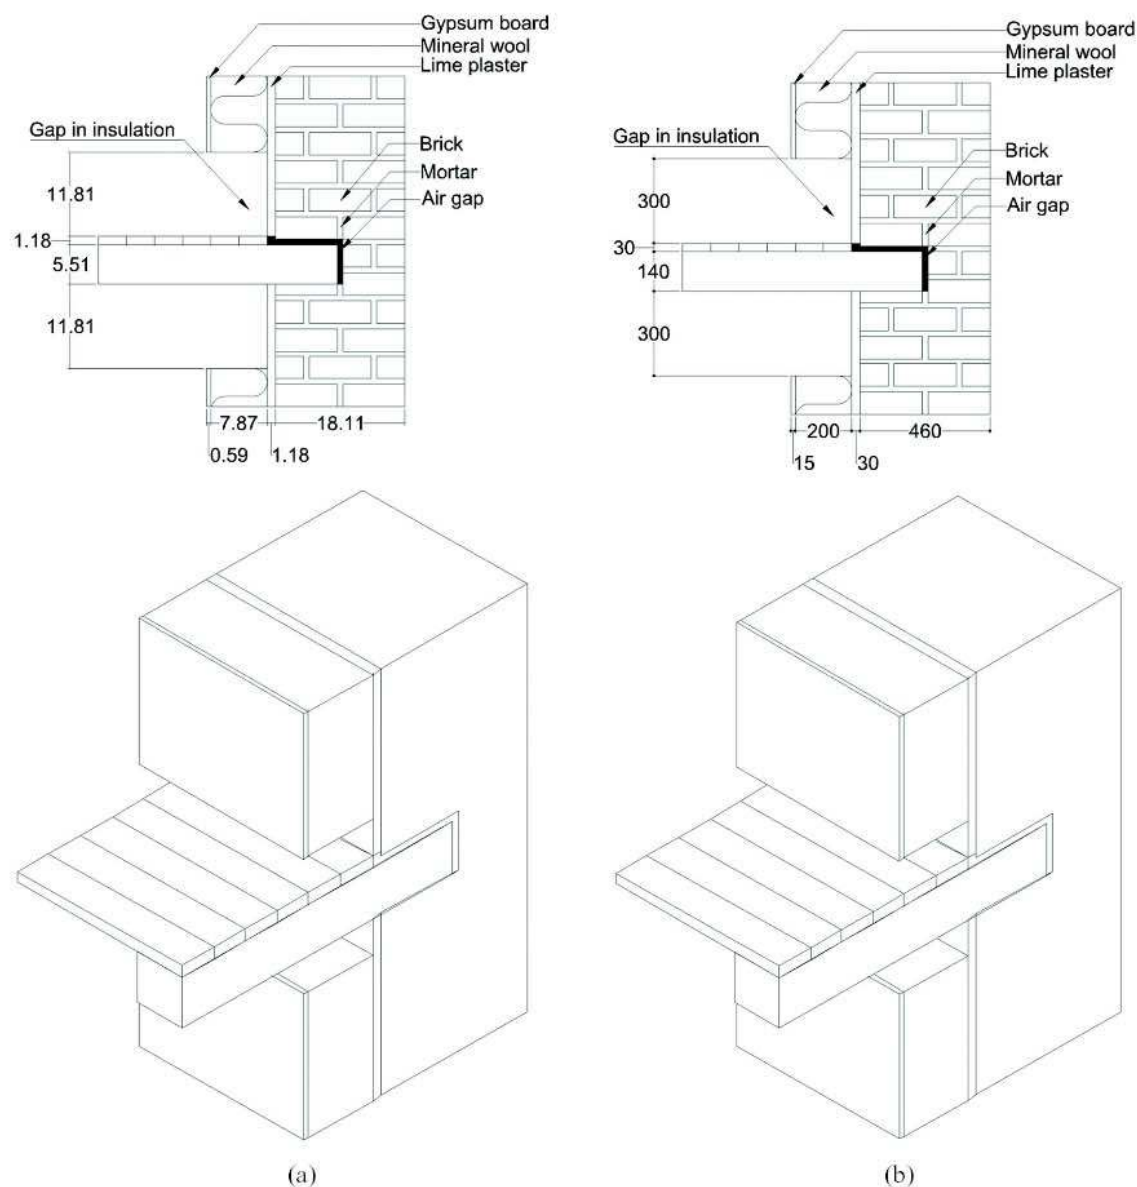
Masonry wall with wooden beam end after retrofitting showing the air gap between the floor and insulation for the two-dimensional and three-dimensional model in (a) I-P units and (b) SI units.
